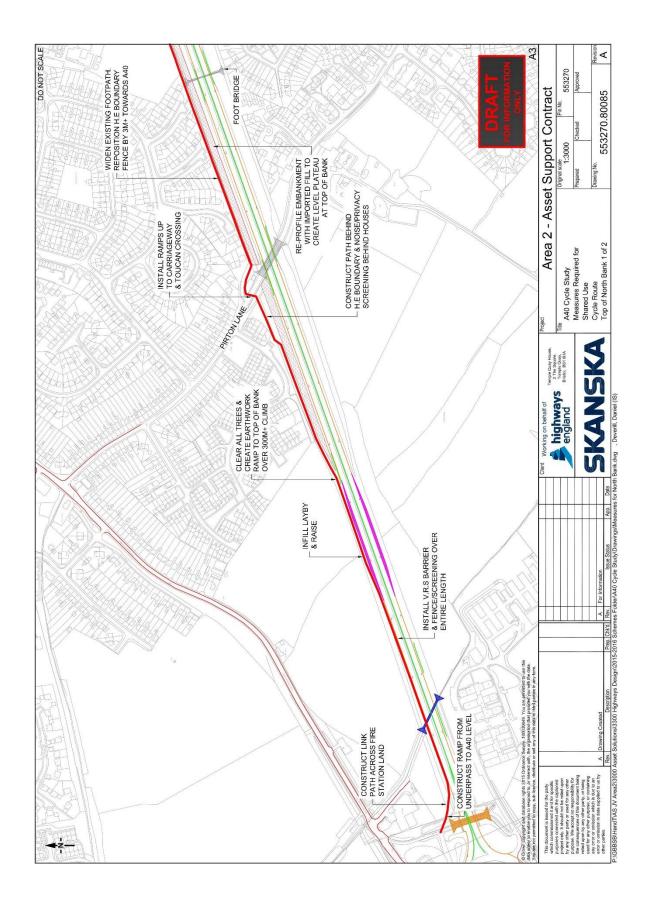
Works required to accommodate a cycle route on A40 alignment (top of bank Elmbridge to footbridge)
